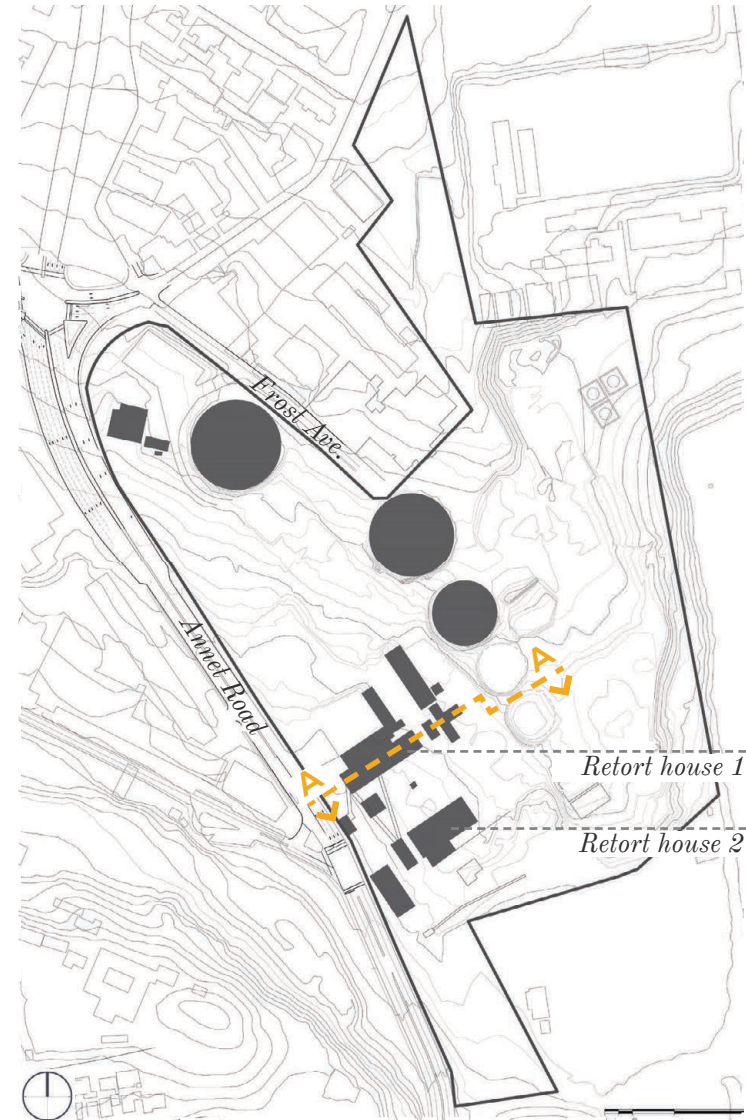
Site map showing retort house and site section position (Author 2017)
